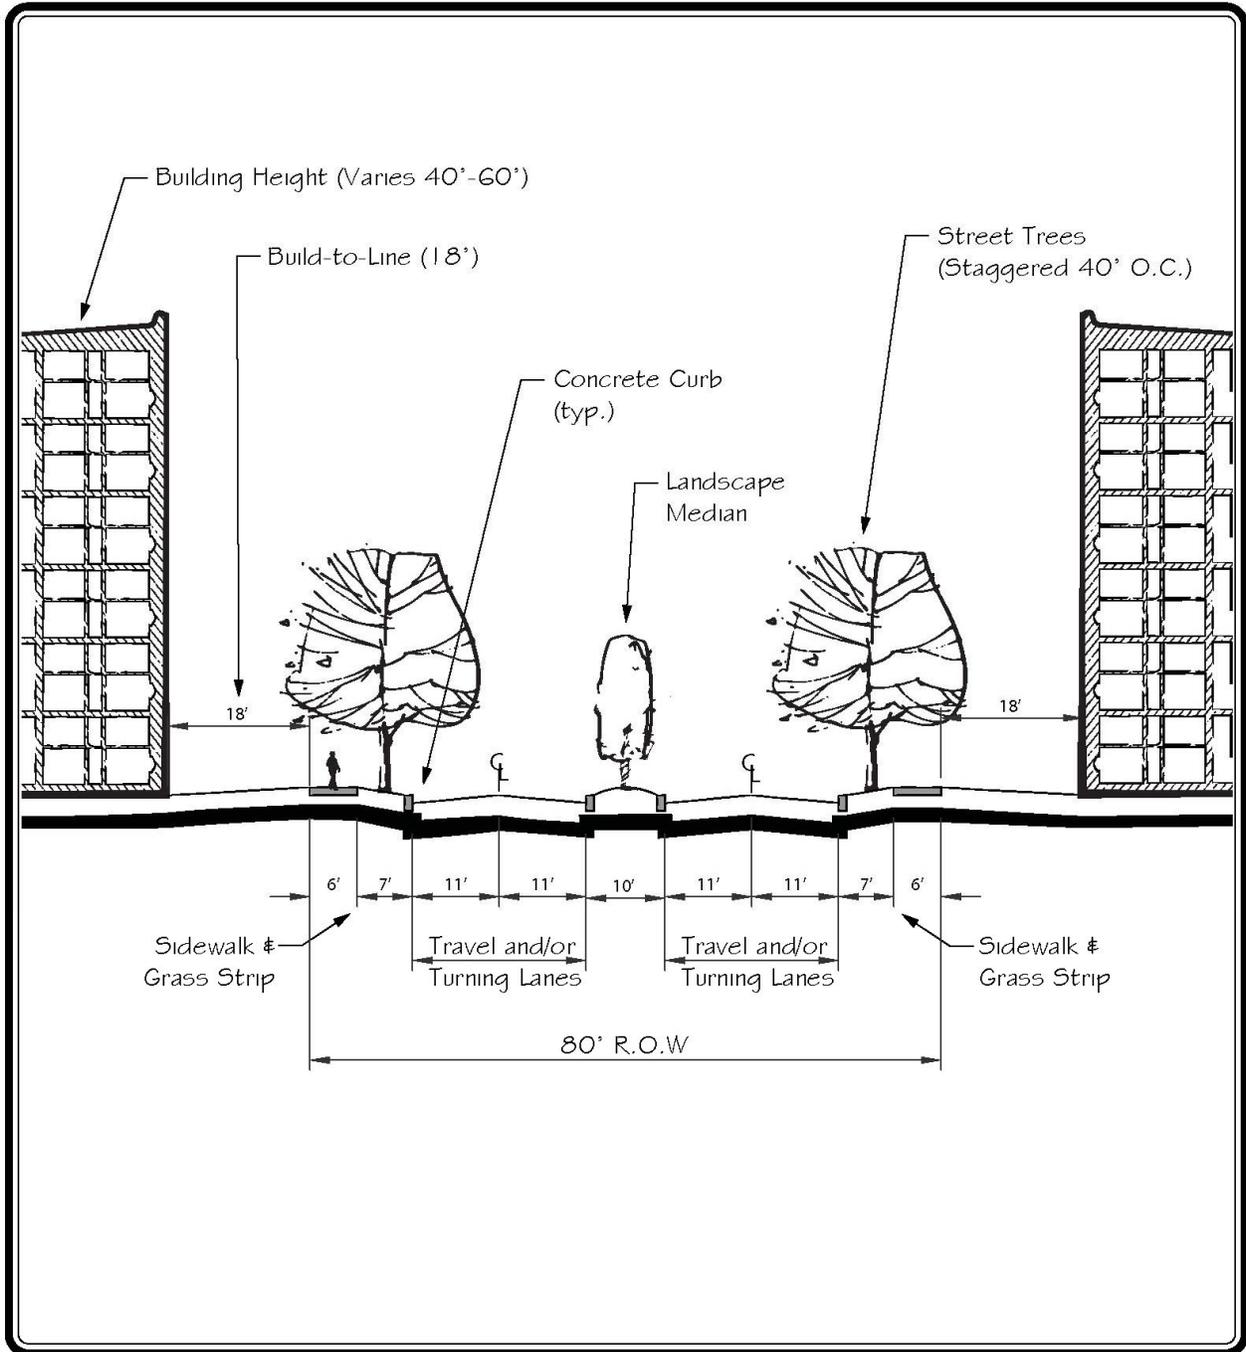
SECTION 314.05 – 01 – TYPICAL BOULEVARD DETAILS WITH NO ON-STREET PARKING
